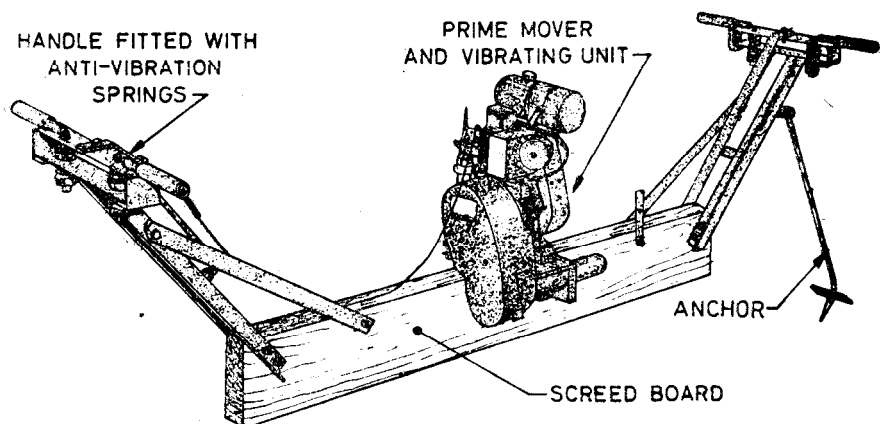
TYPICAL SKETCH OF SCREED BOARD CONCRETE VIBRATOR
